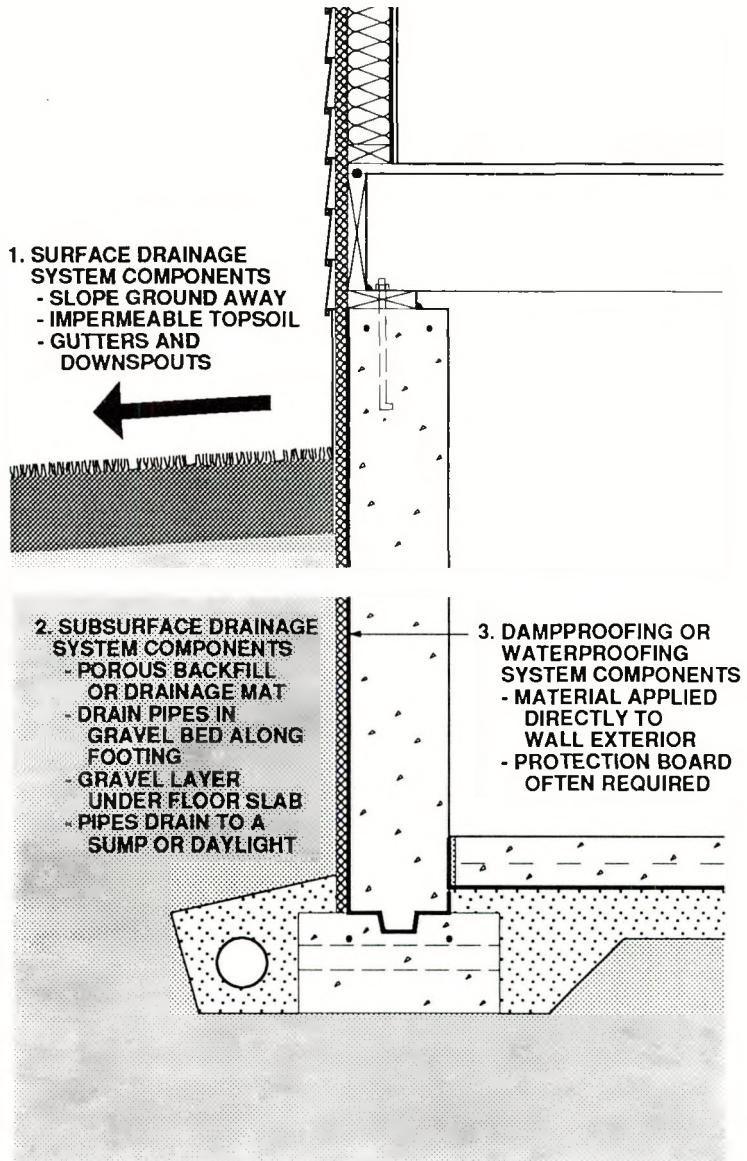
Components of Basement Drainage and Waterproofing Systems
